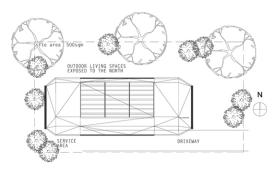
Lara Calder site plan, scale 1/400 (Lara Calder, 2008)
